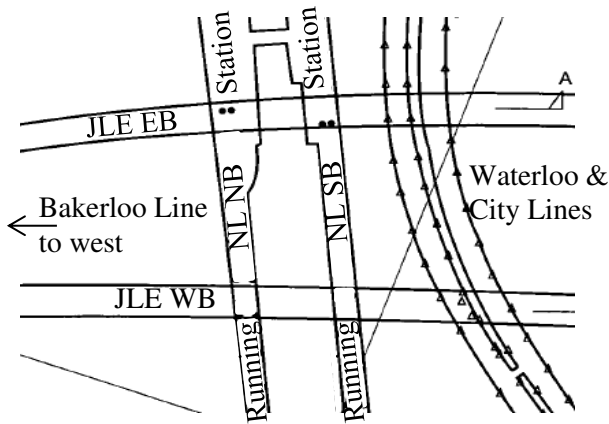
Plan detailing respective geometries of JLE and NL tunnels (Standing and Selman, 2001)
